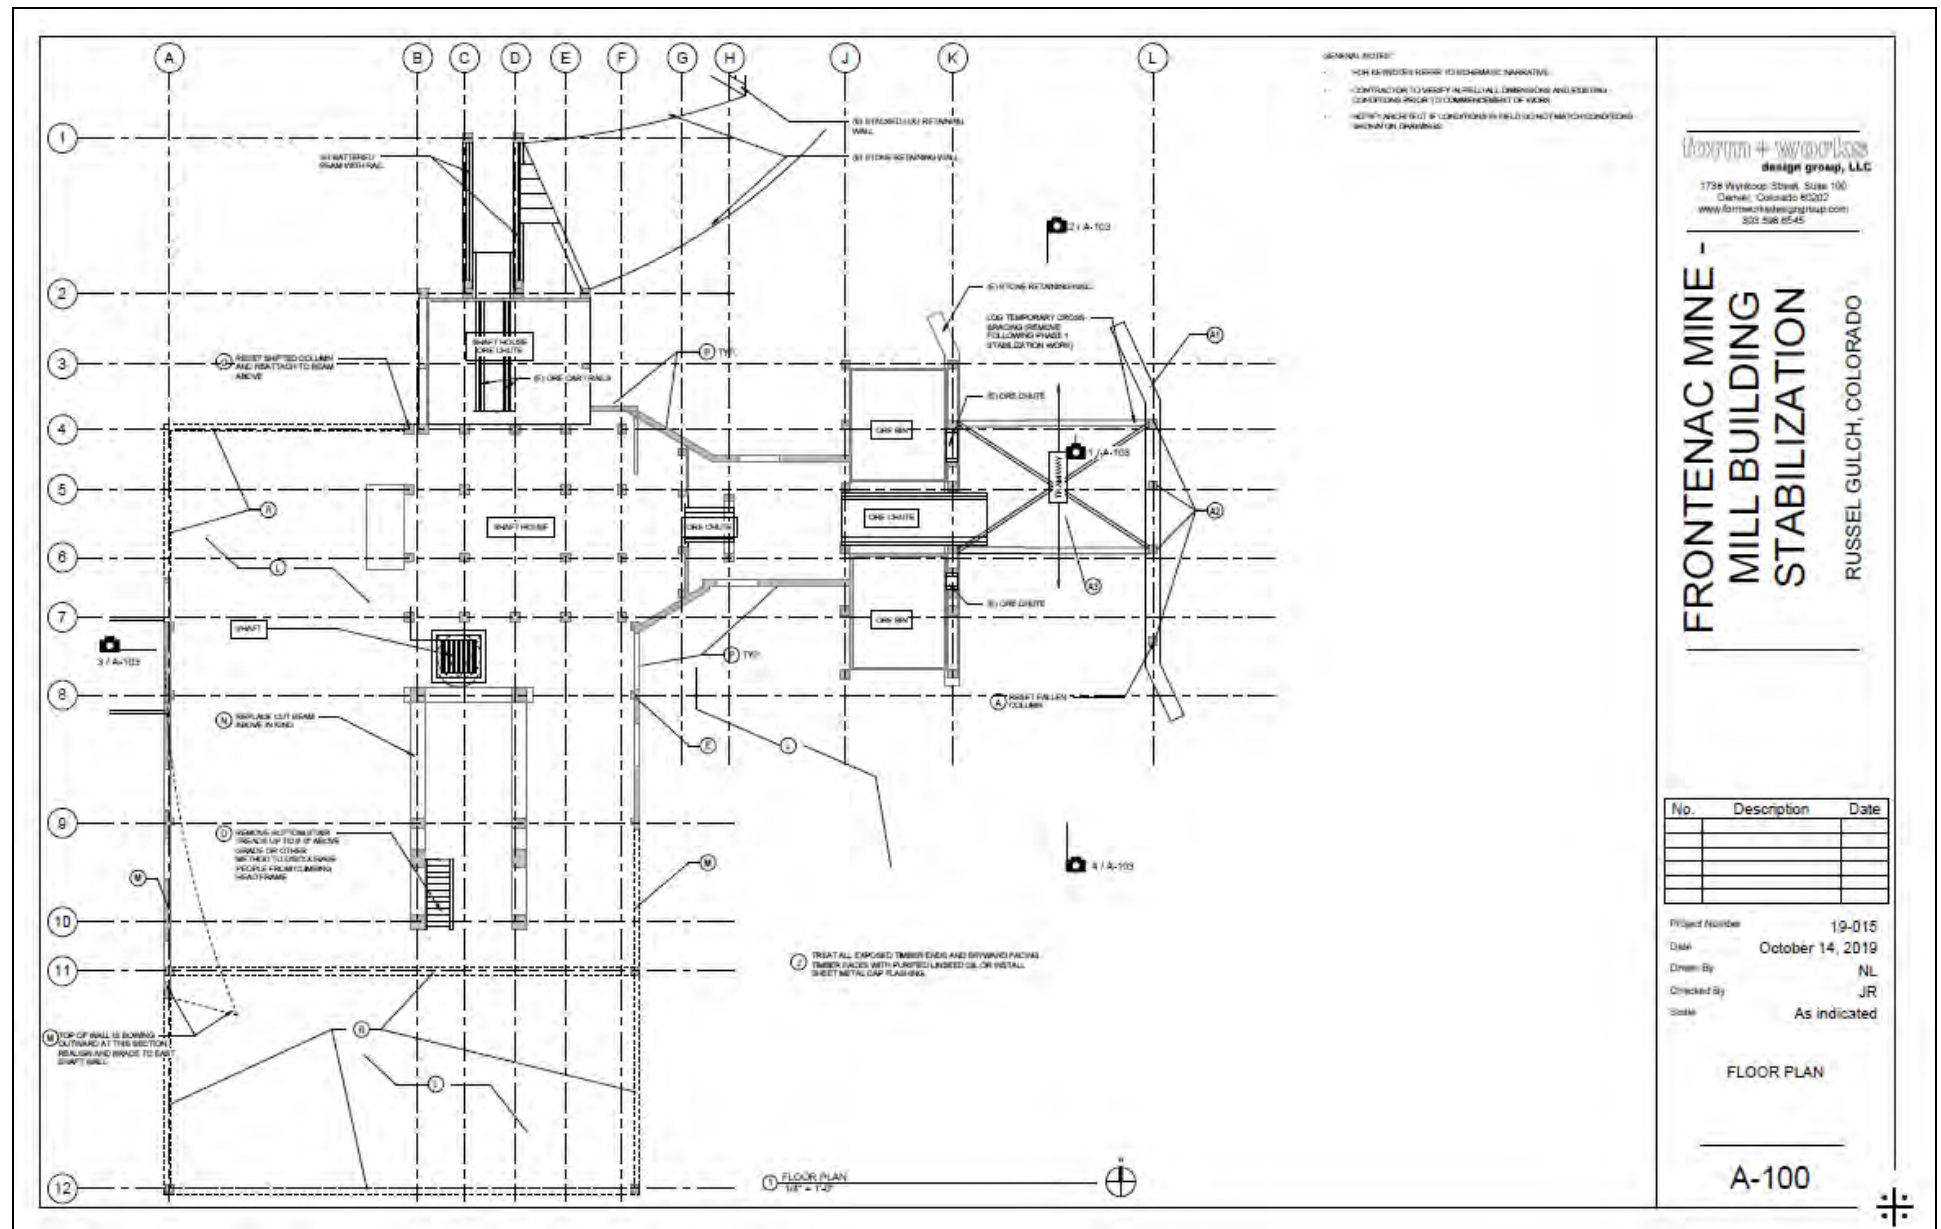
Floor plan of the Frontenac Shaft House, first floor. Courtesy of Form+Works Design Group, LLC. 2019.
